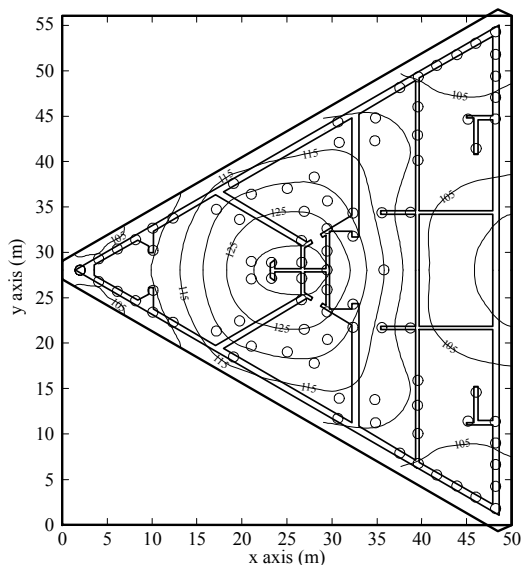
Foundation layout and computed settlement contours for Hotel Tower.
